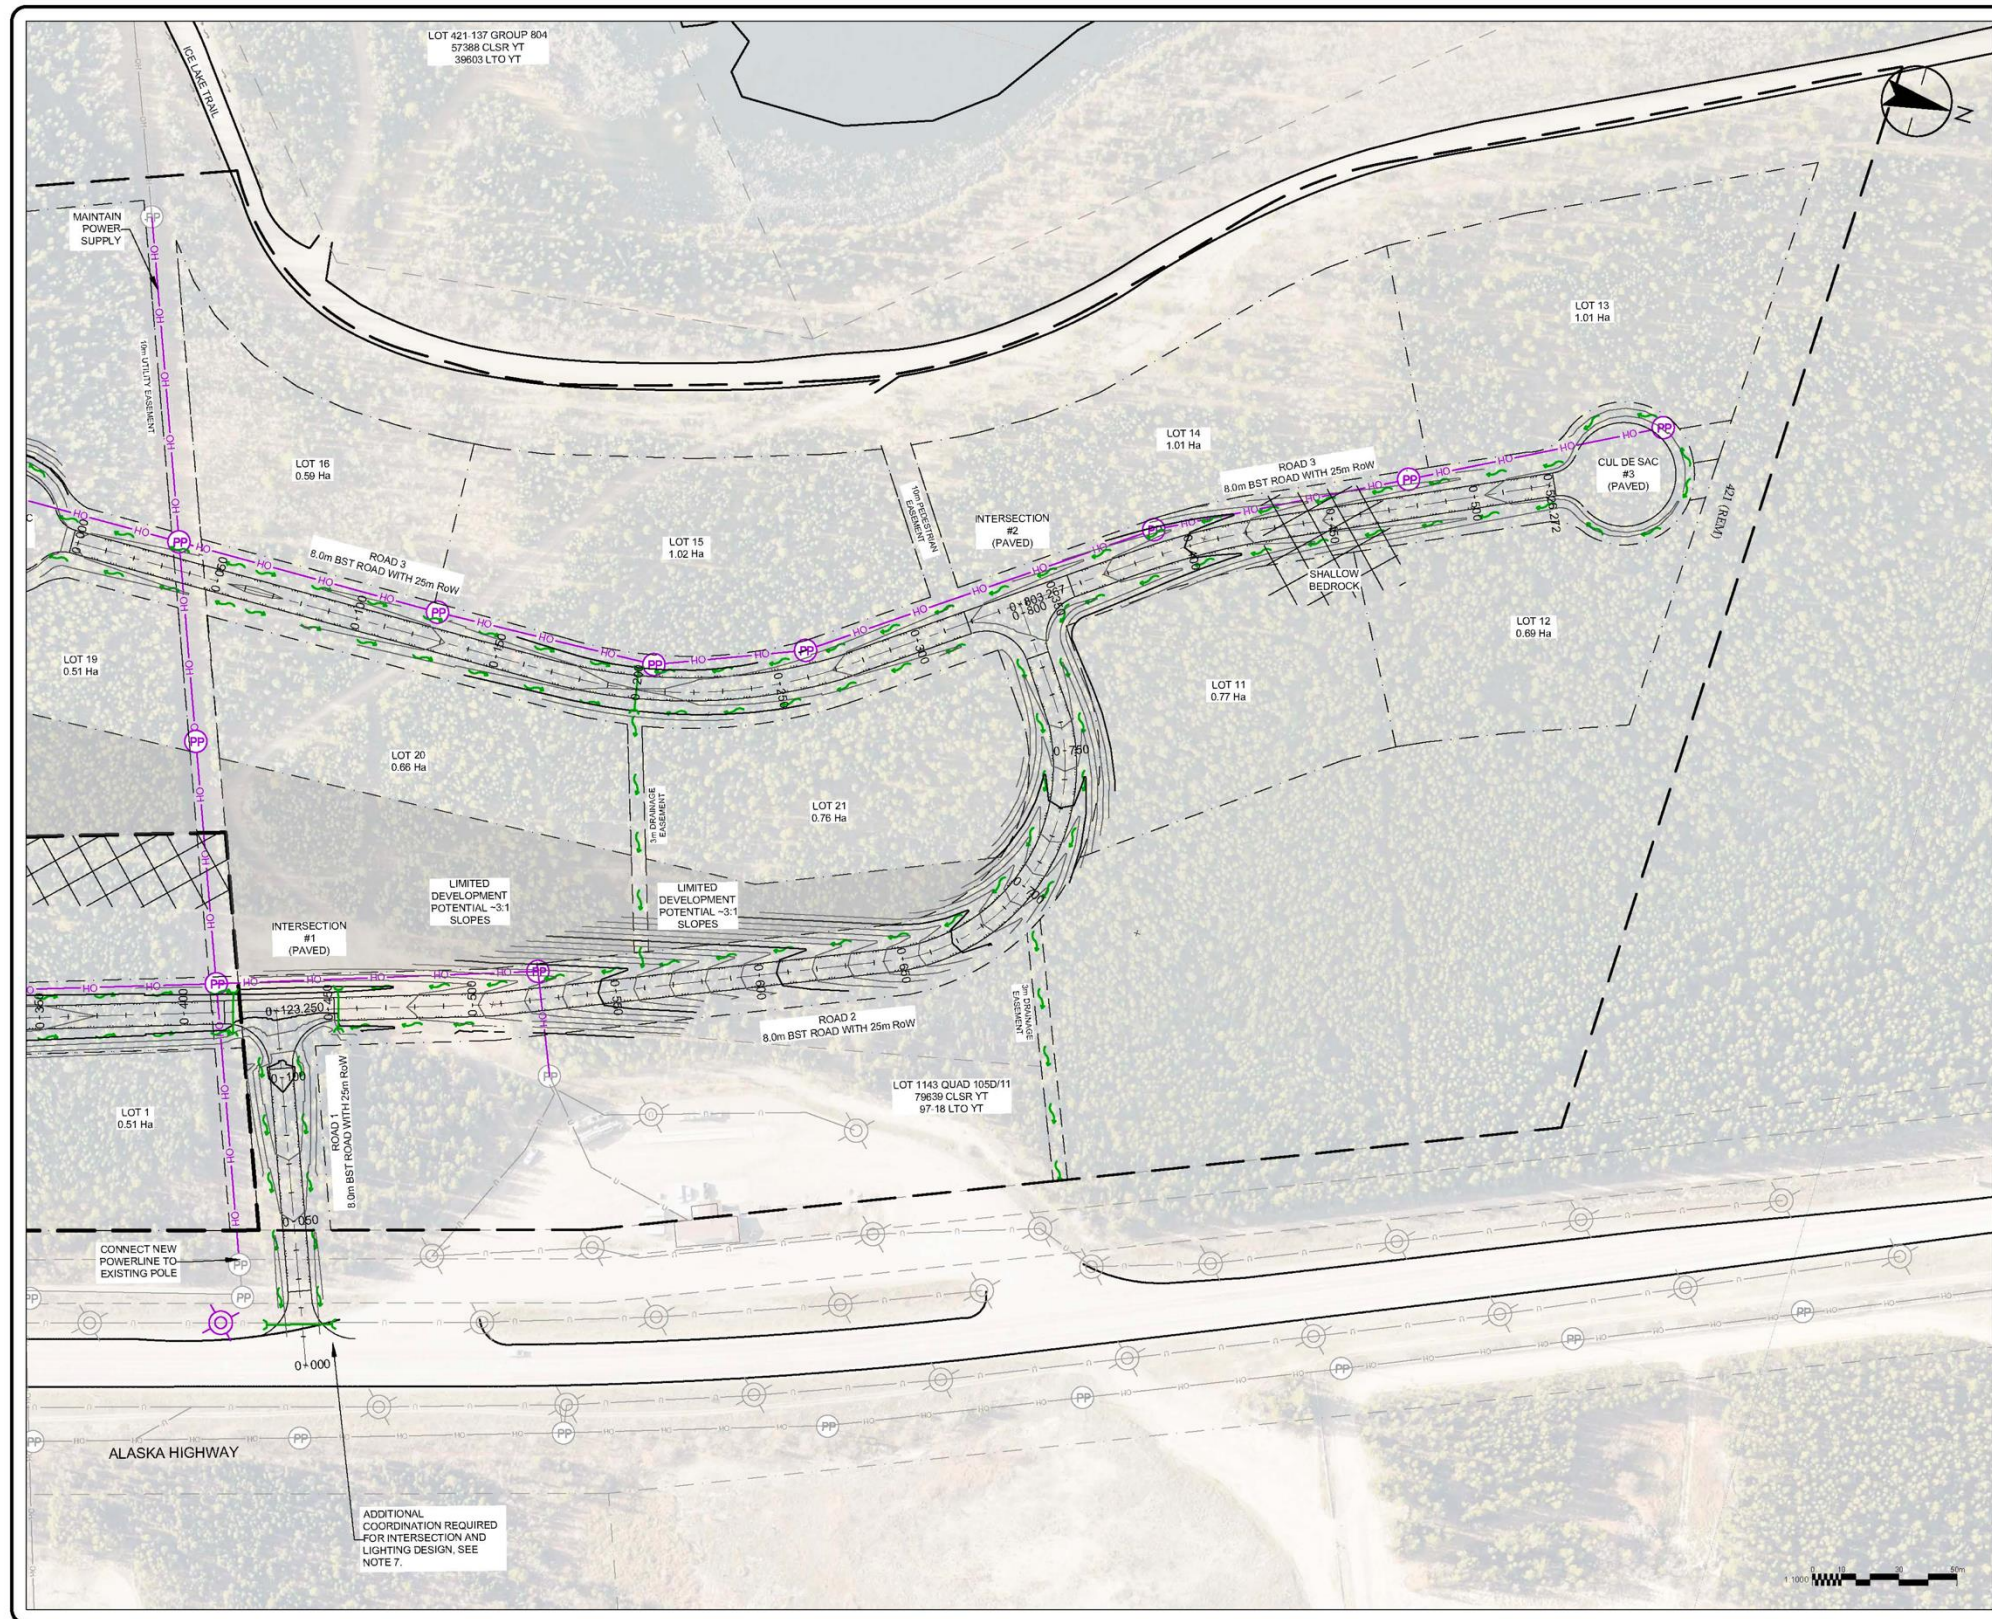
PRELIMINARY SITE LAYOUT AND DRAINAGE PLAN (NORTH)
